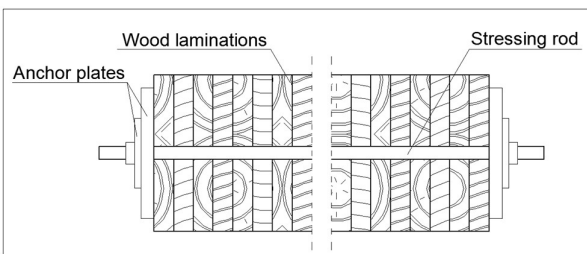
Section of a pre-stressed timber bridge deck (after Ritter (1992))
